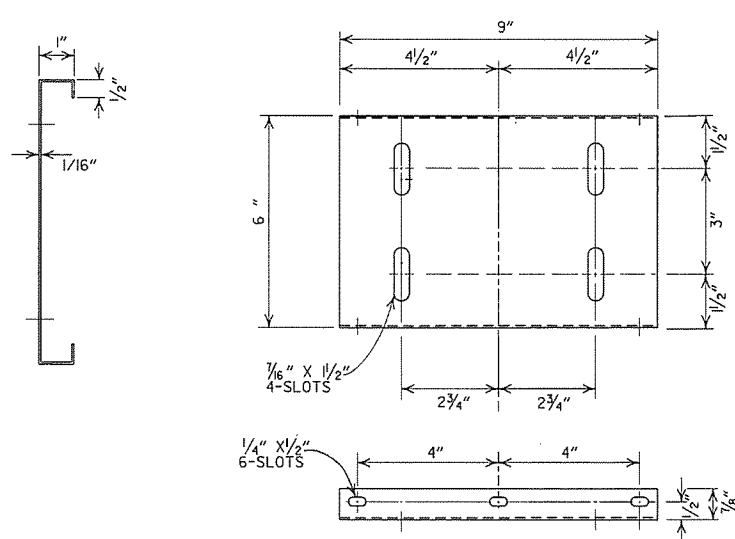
DETAIL OF TERMINAL ANCHOR POST (TYPE I)
